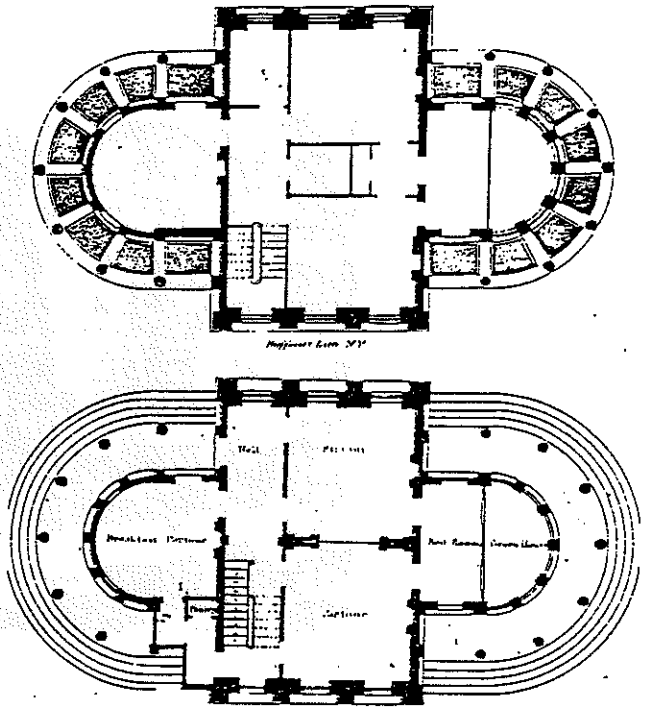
Floor plans of design from Minard Lafever, 1838. (Lancaster 222).
